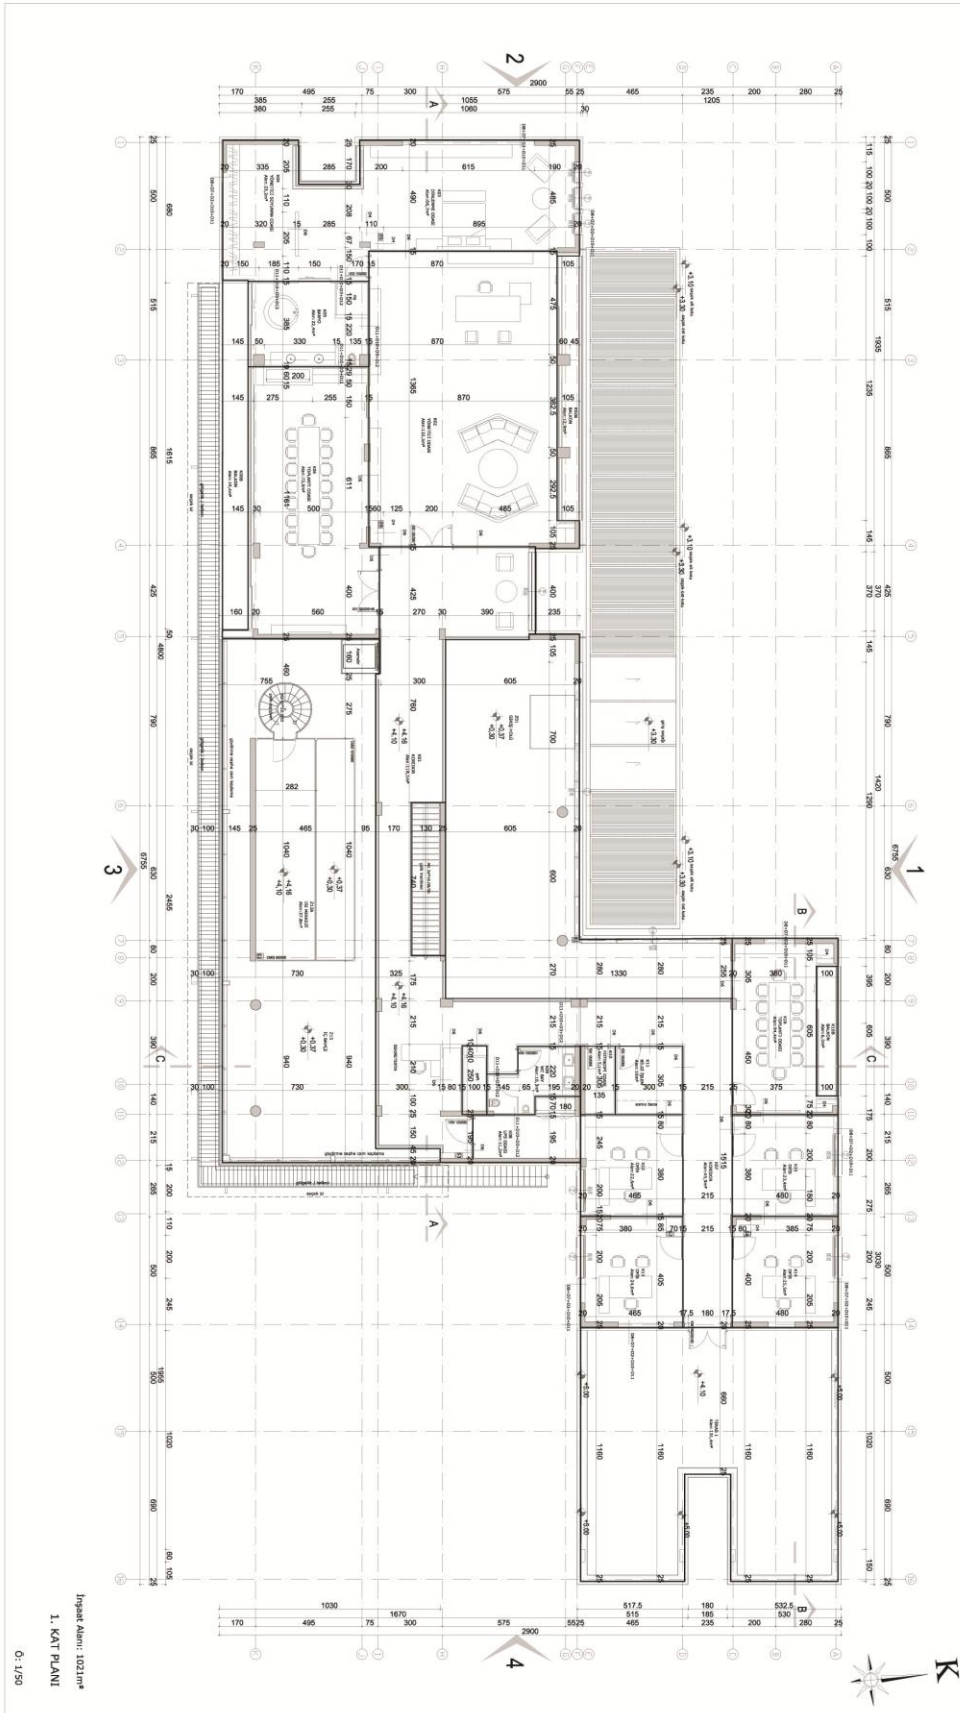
3: Case study A Ground Floor Plan
